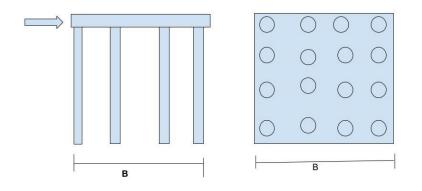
Schematic diagram of a pile group subjected to lateral loading
